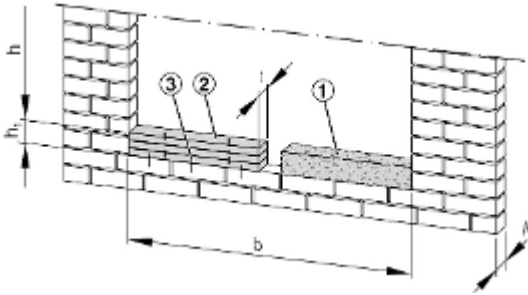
Installation opening with concrete or calcium silicate boards for height adjustment
